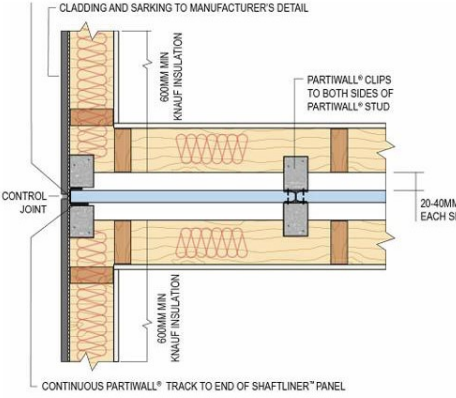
Clad Wall Junction with Thermal Break – Plan View
